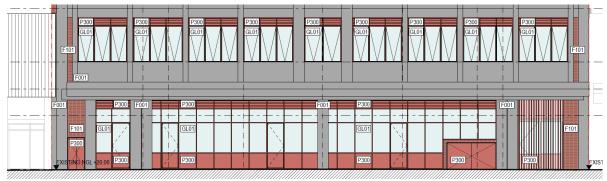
Ground floor (and level 01) response to Johnston Street (Applicant submission, July 2022)
